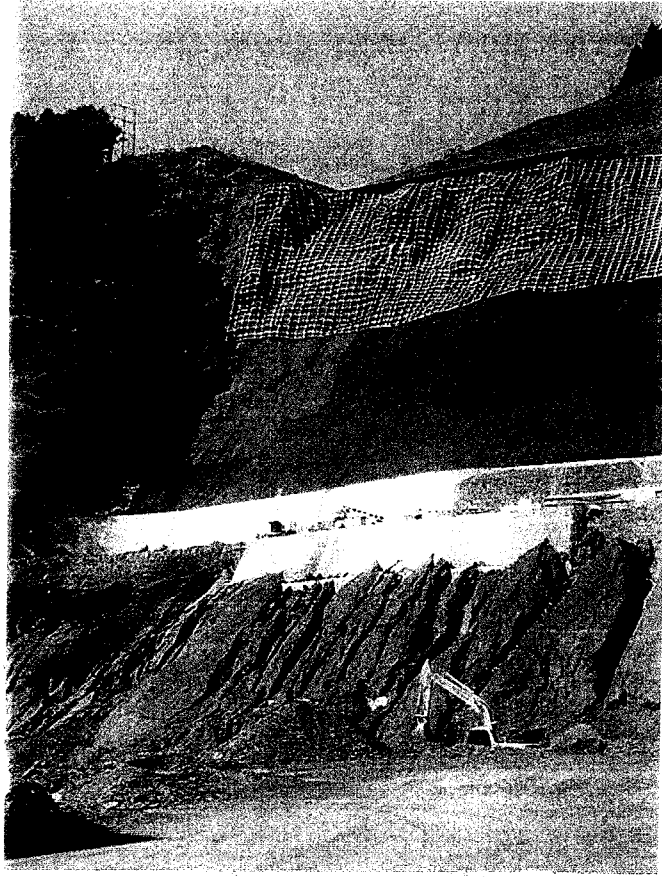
Overall view of the steep construction site covered with lattice shaped ferroconcrete frames.
